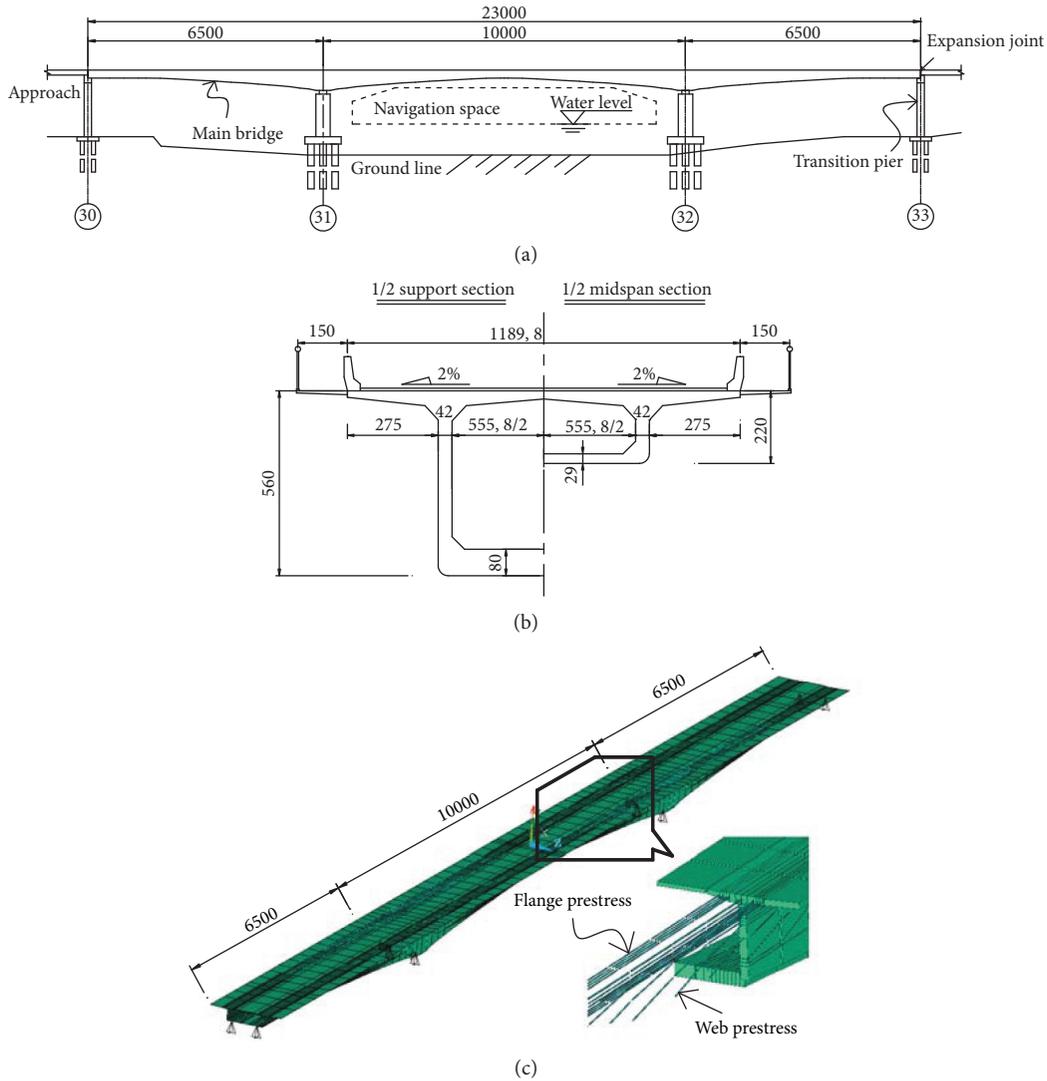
Model of the prototype bridge (unit: cm). (a) Elevation. (b) Cross section of box girder. (c) ANSYS model and prestress.
